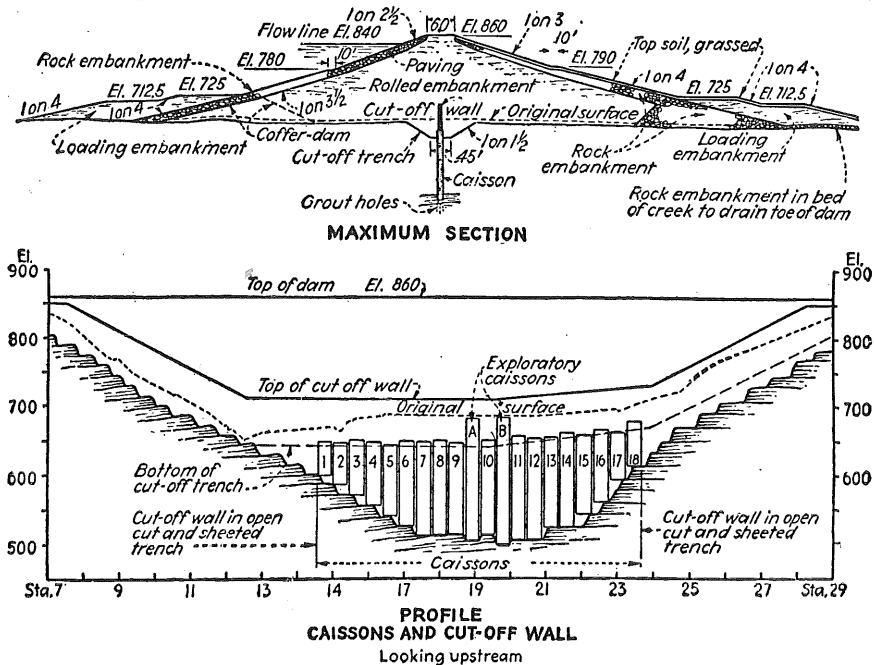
CAISSONS FOR CUT-OFF WALL OF DAM.
